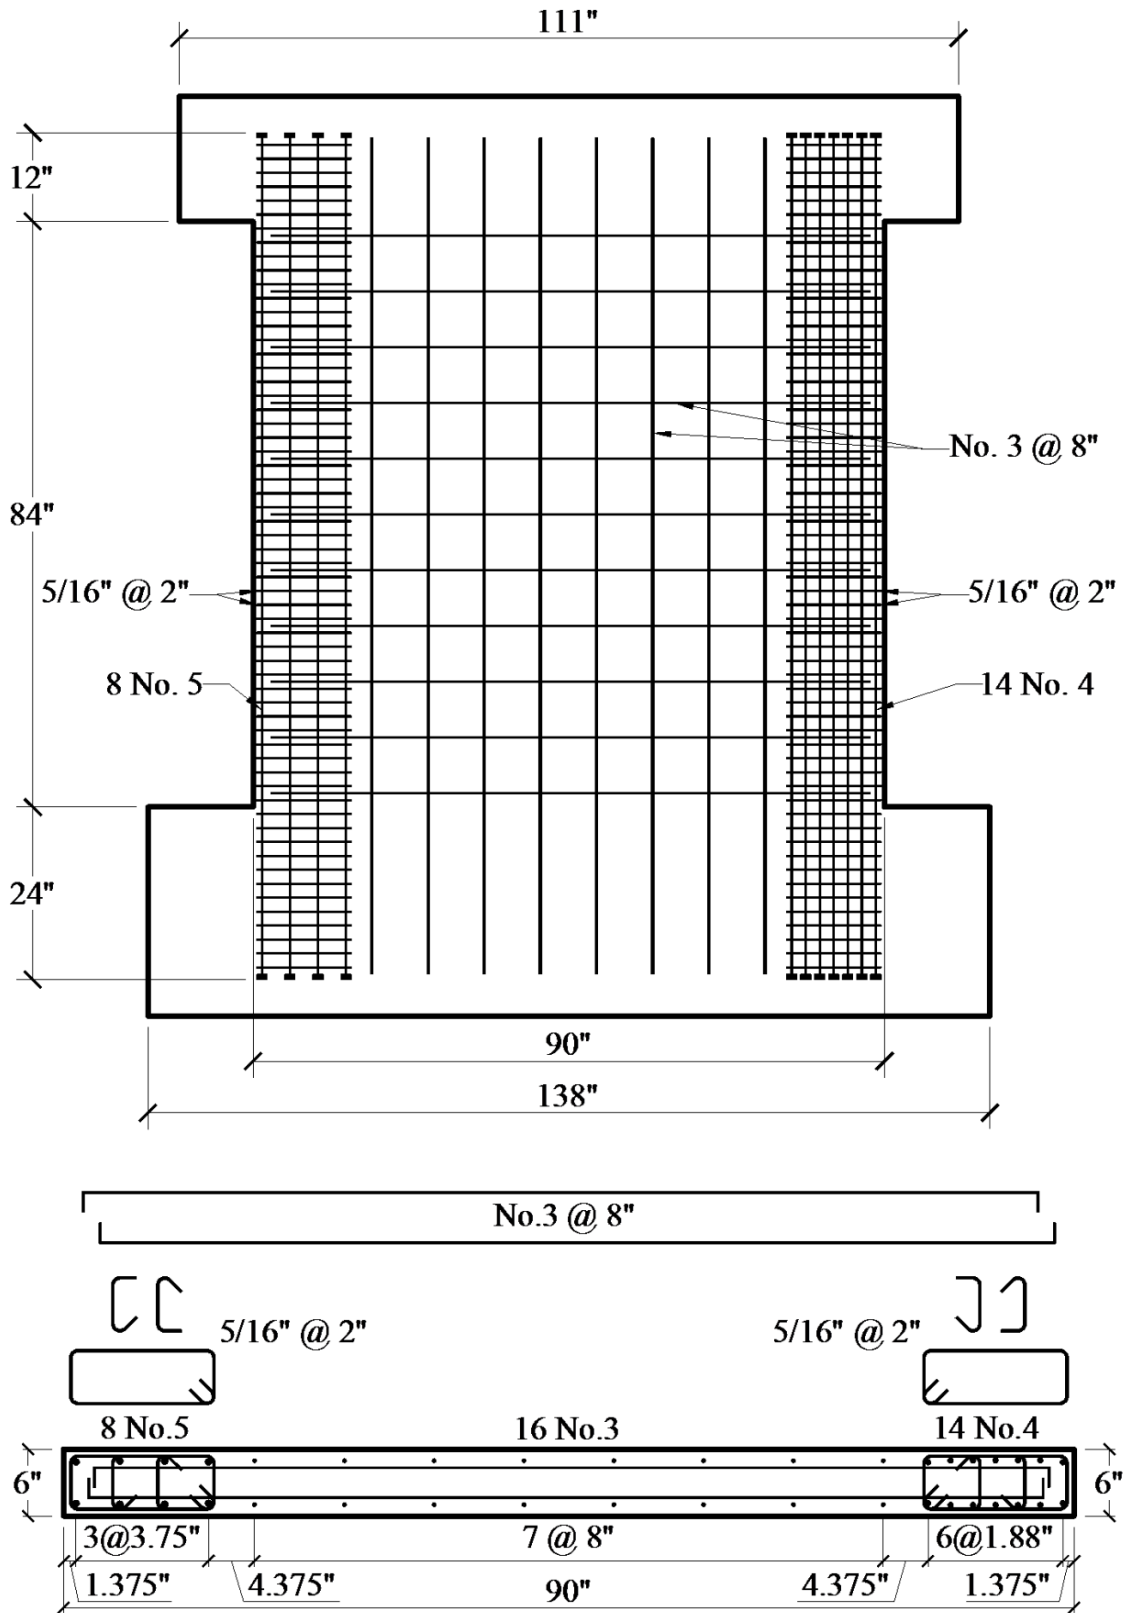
Specimen WP2 reinforcement (Conversion: 1"=25.4 mm)
